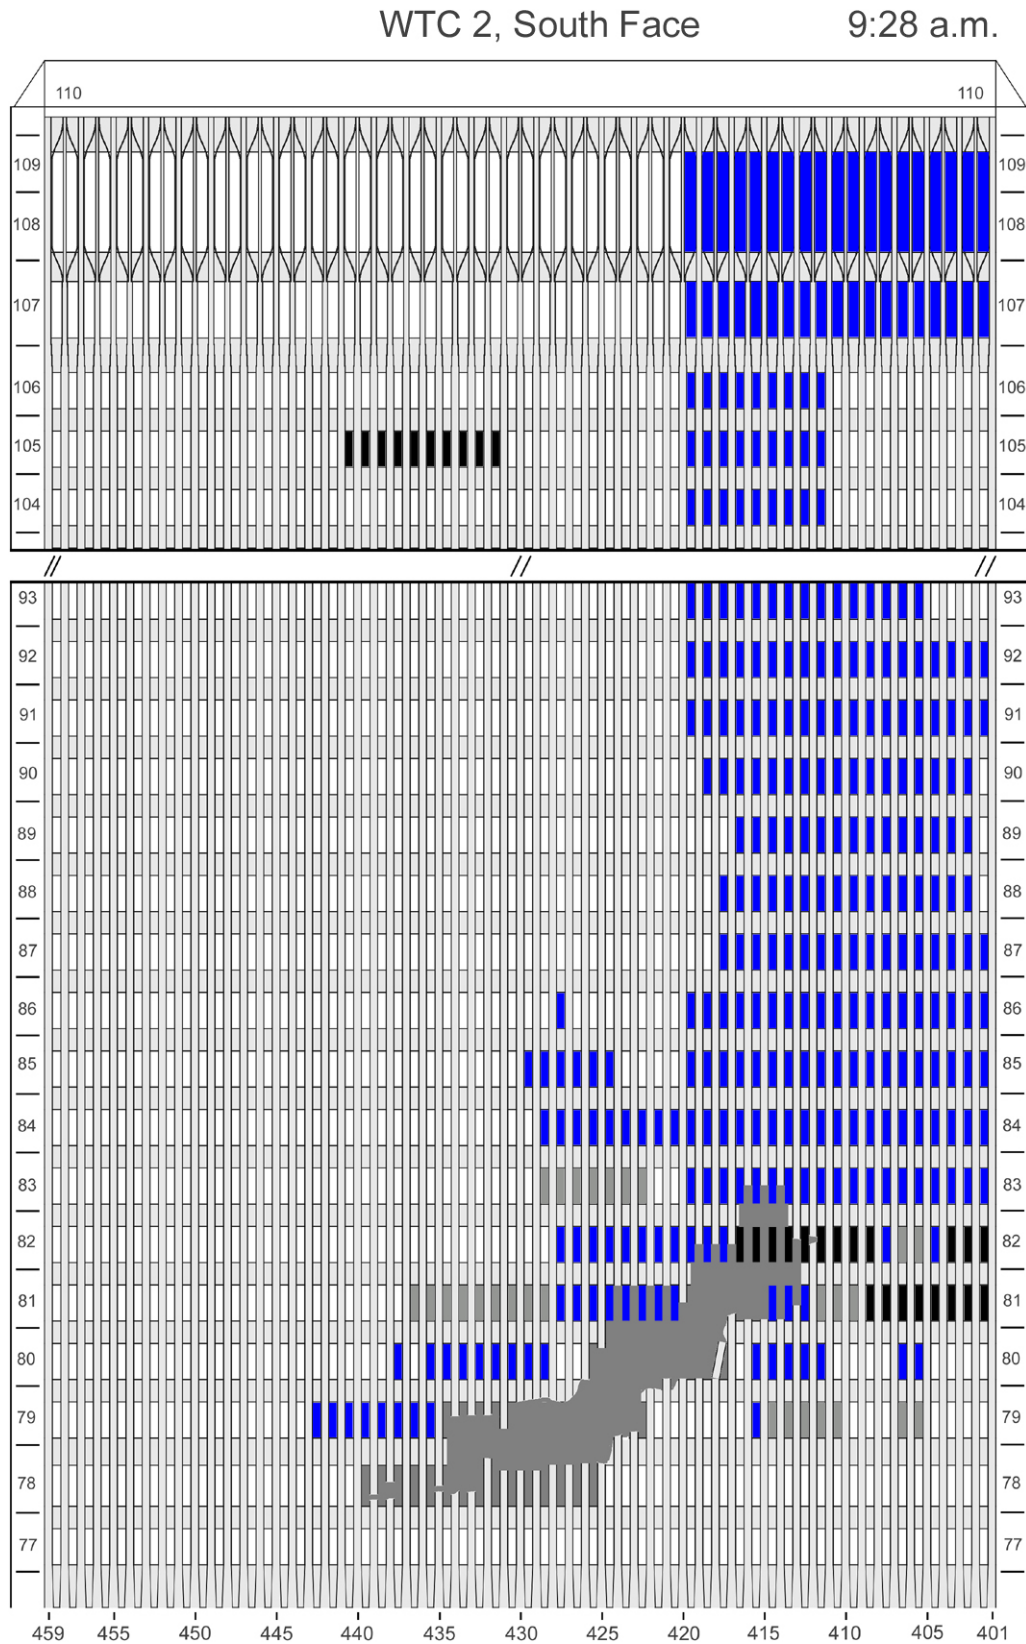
Diagram of the south face of WTC 2 for floors 77 to 93 and floors 104 to 110 at 9:28 a.m. showing windows where smoke was observed and those hidden from view.
